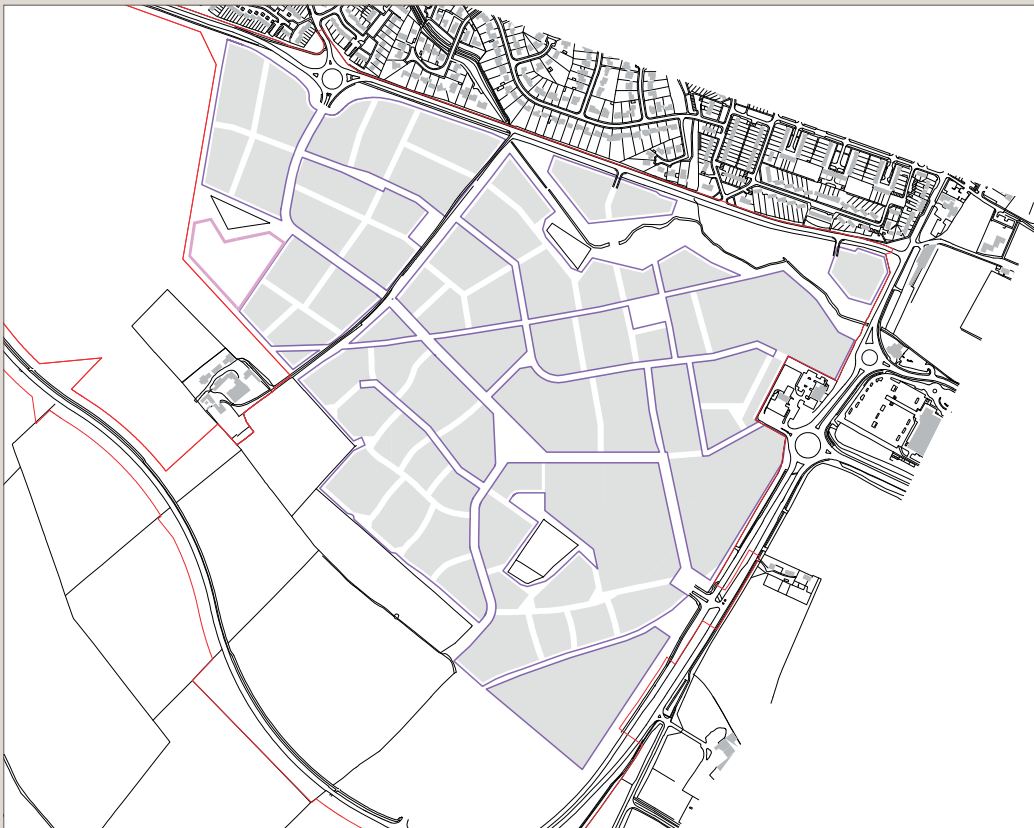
In order to create a permeable place these will be further sub-divided forming a set of smaller MINI-blocks. An indicative layout is shown left. Where this layout is used in the Code it is illustrative only.
